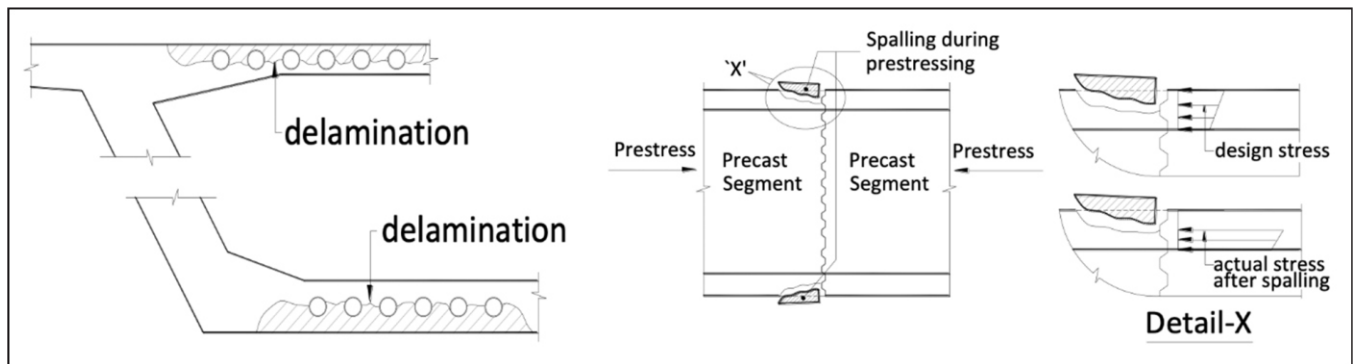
Possible failure mode due to delamination in Precast Segments during prestressing
